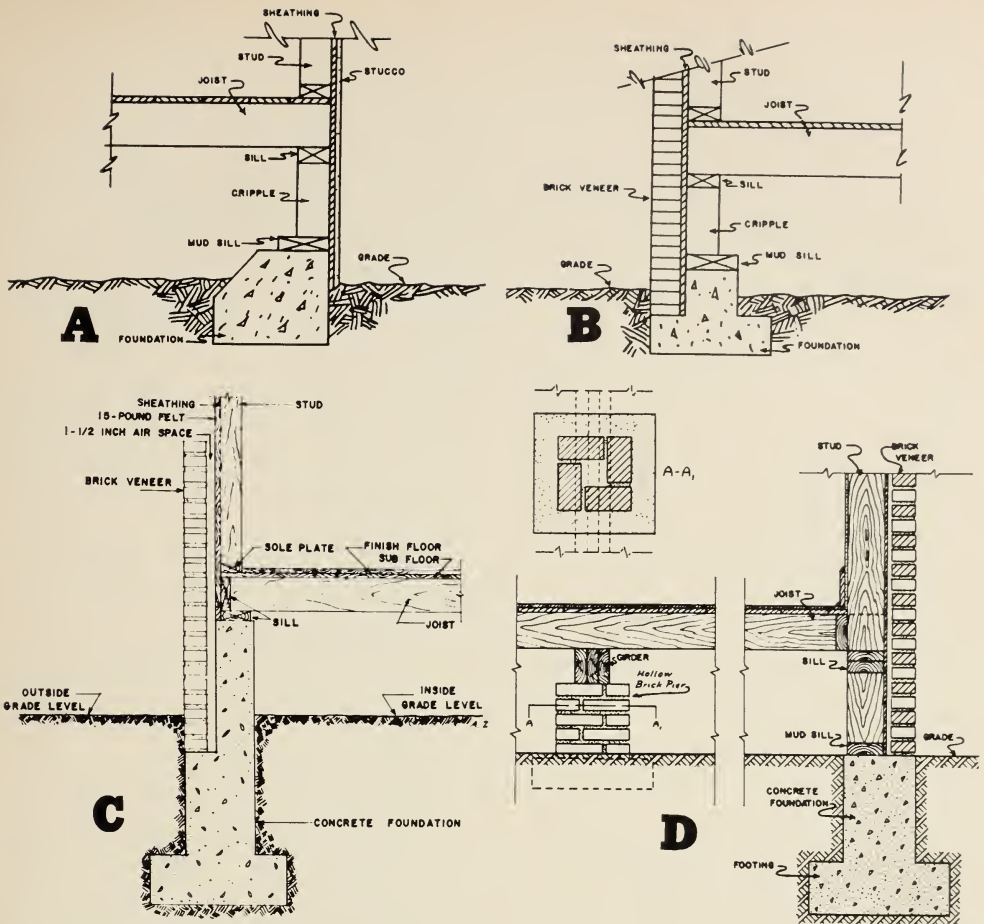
Types of construction: A. sheathing of stucco-frame house in contact with soil; B. brick veneer construction with wood sheathing extending below soil line; C. brick veneer extending below grade on frame house; D. sill at grade on frame house, brick veneer, hollow brick intermediate pier. (From Heal, 1951.)
